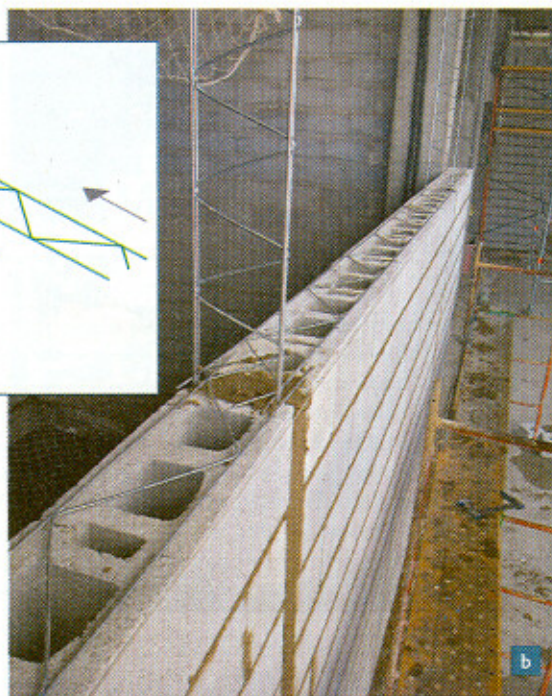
Placement of overlapping Murfor truss reinforcement at the vertical of the rib.
